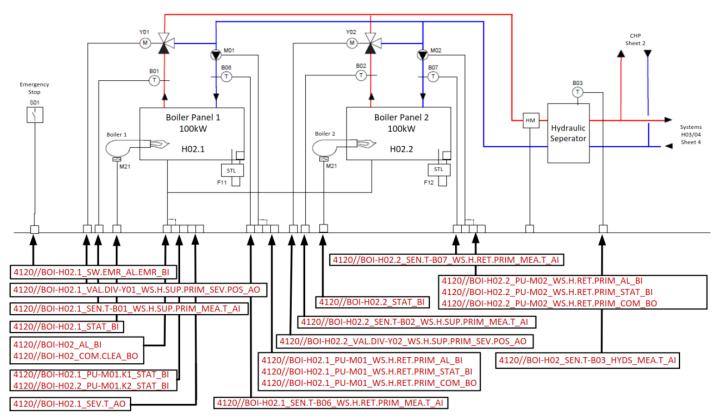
Boiler in case study 2 (office building) (source: Johnson Controls International Plc).
